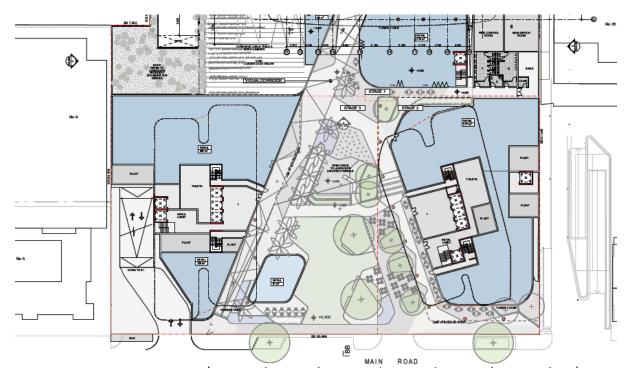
Approved Ground Floor Plan for 19 Hercules Street, Hamilton (DEV2020/1165)
